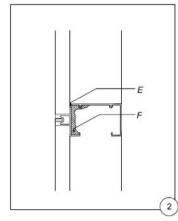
Stick system — joinery — typical expansion joint assembly
